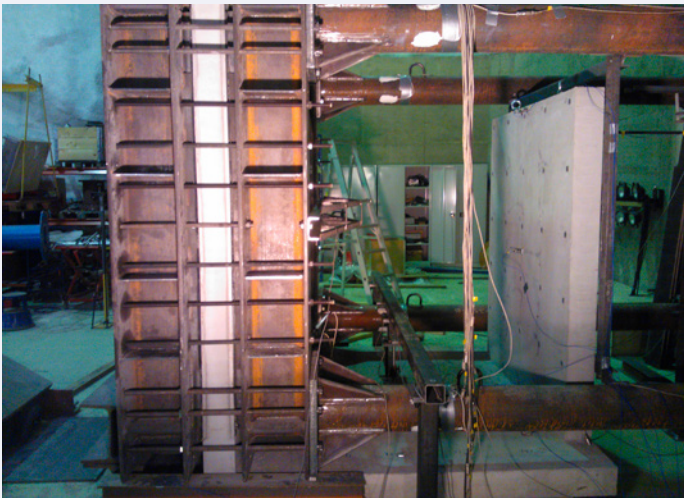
The wall-floor-wall reinforced concrete structure used in the vibration propagation and damping test series VOA-VOC as placed inside the test frame. The impacted wall is on the left.
